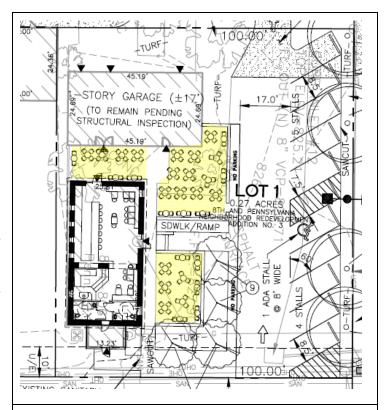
Proposed layout shown on associated site plan. Outdoor seating area is highlighted in yellow.
